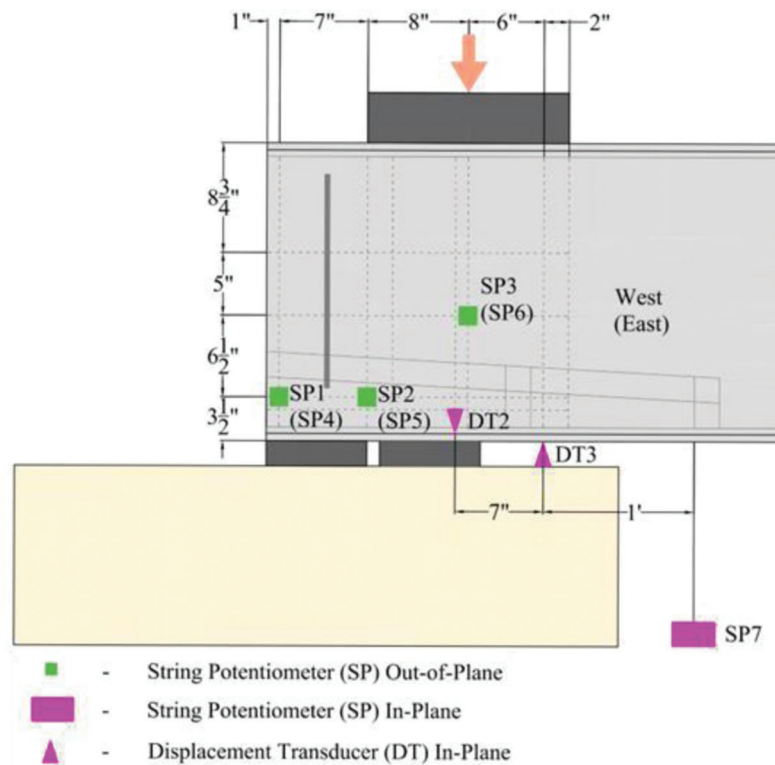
Displacement sensor layout (side elevation): Specimens 4 and 5.
